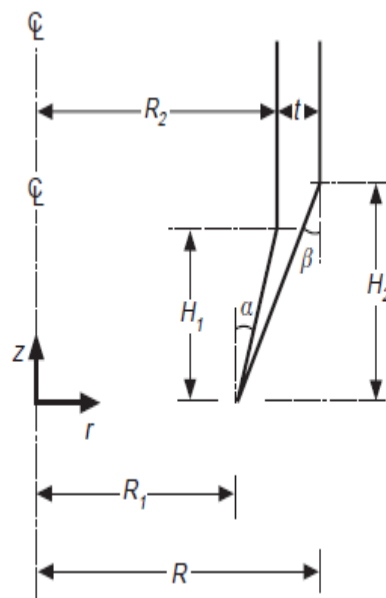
Dimensions of a tube sampler (Clayton *et al.* 1998)
